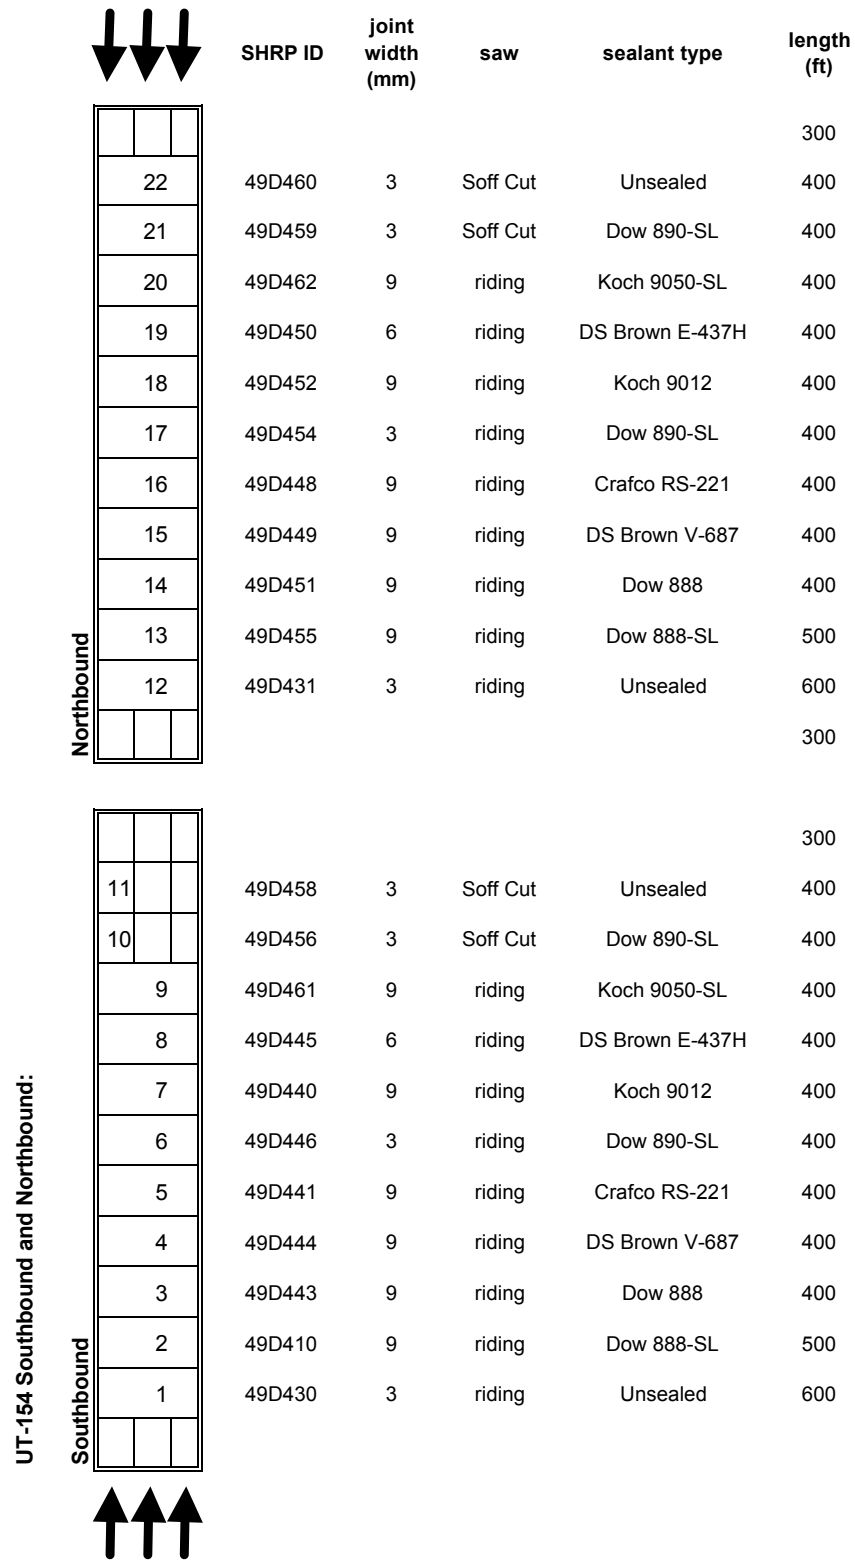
Salt Lake City, Utah SPS-4 supplemental test section layout.
